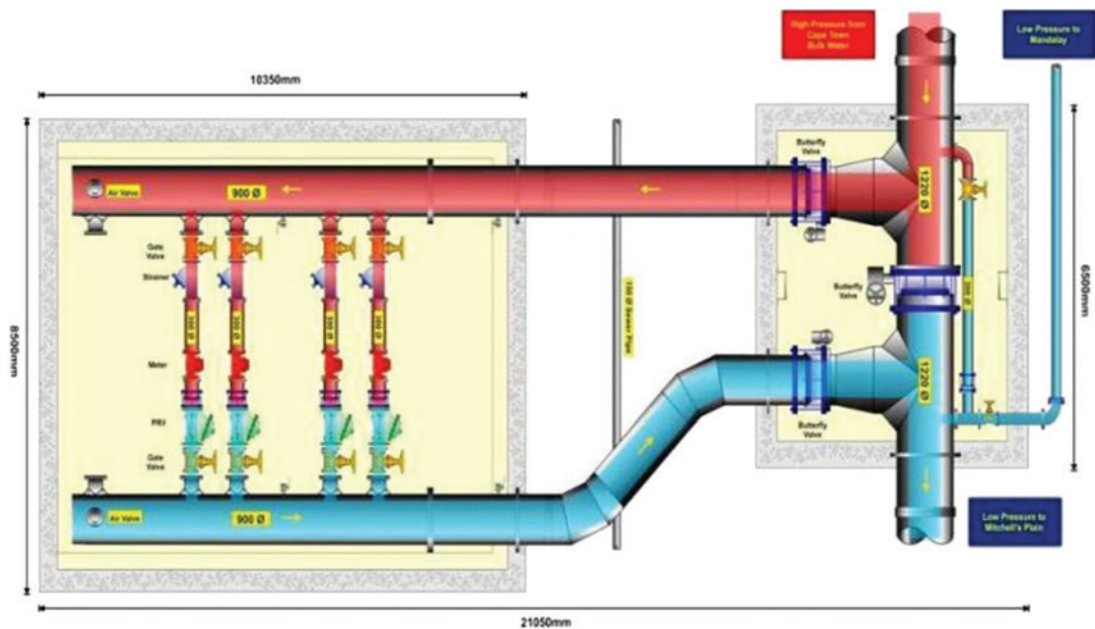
Schematic layout of the Mitchell's Plain installation.
